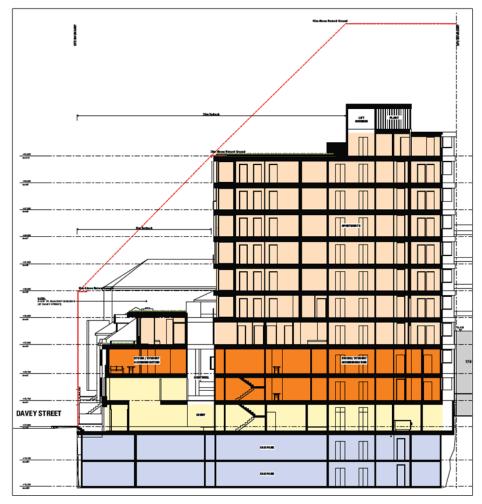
Section drawing illustrating the proposal set within the parameters of the building envelope (red line) shown for context (source: JAWS Architects)
